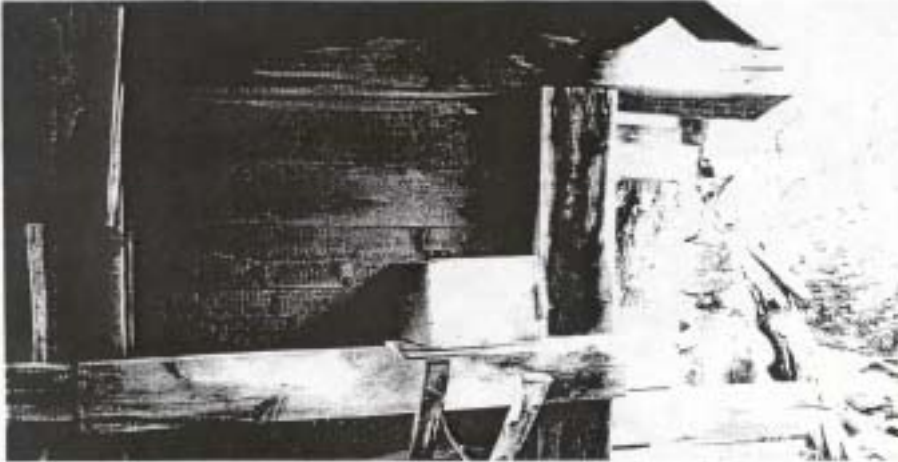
LOOKING AT DOWNSTREAM END OF SOUTH ABUTMENT
